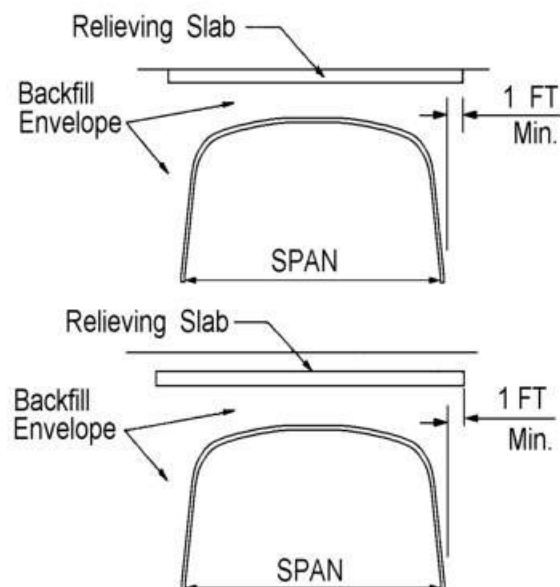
Metal Box Culverts with Concrete Relieving Slab
